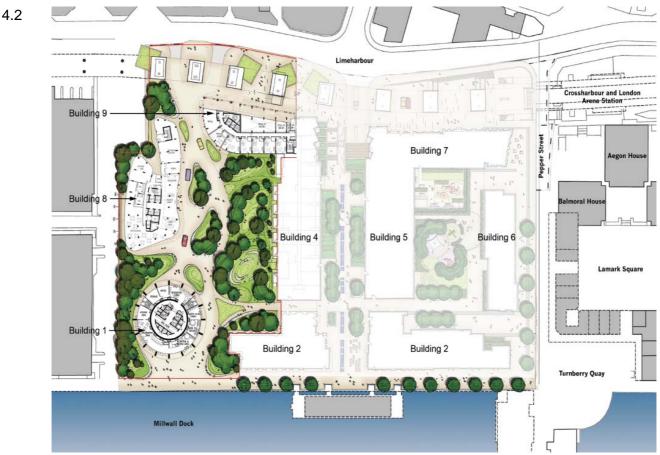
Showing the proposed locations and layout of buildings in phase I of the consented application and the proposed phase II.
